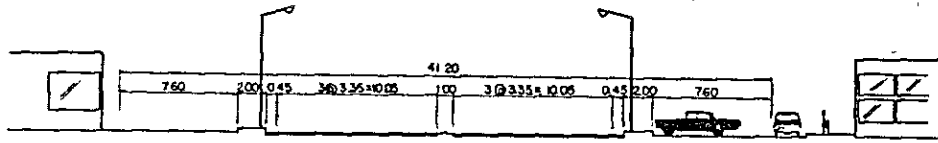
WIDENED CROSS SECTION OF VIA ESPANA(1)
